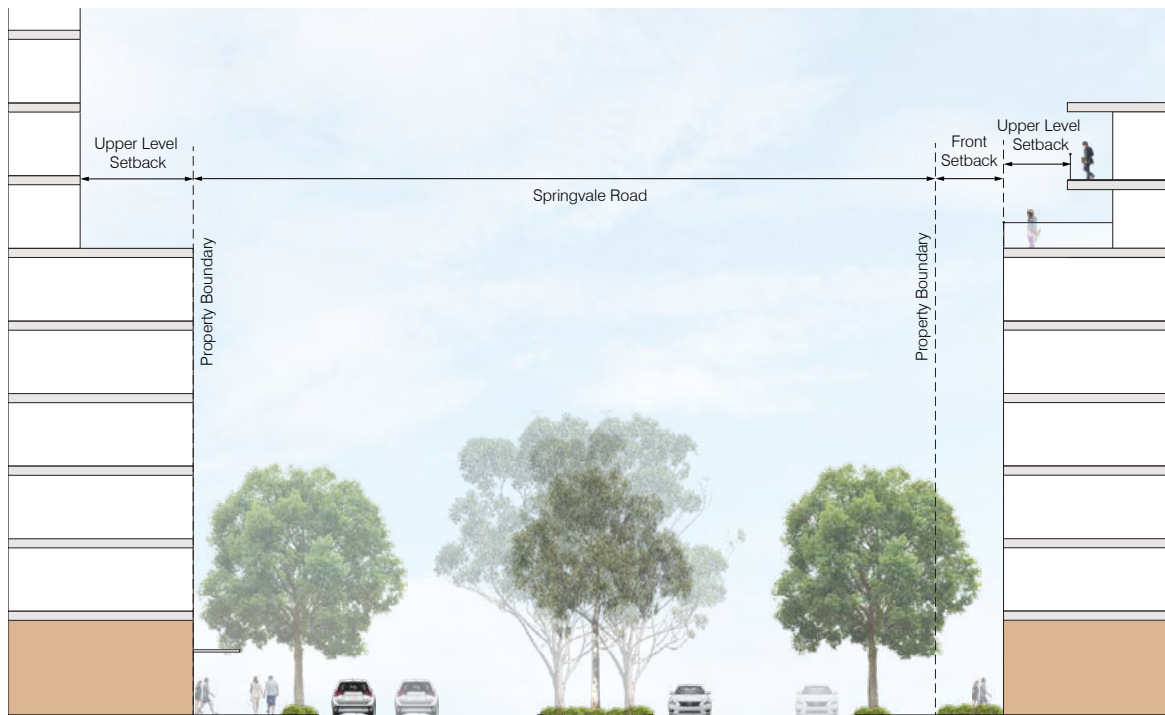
Section A - Illustration of potential typical section of Springvale Road with built form interface
